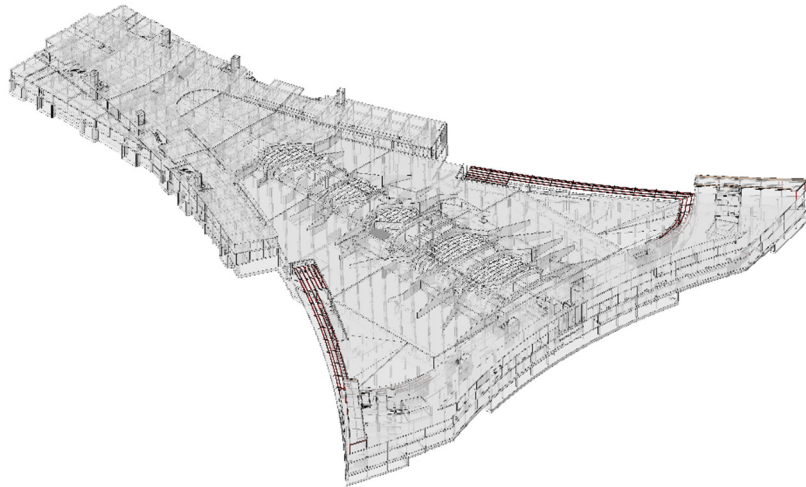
Reinforced concrete structure for the garden and APM station (PTB Zone H).
